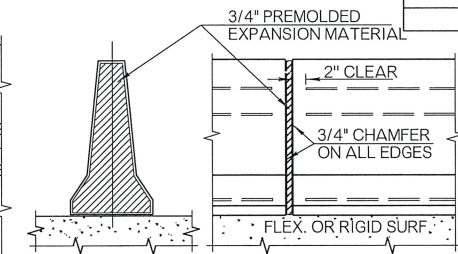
DETAIL OF TRANSITION SECTION AT BRIDGE ENDS
